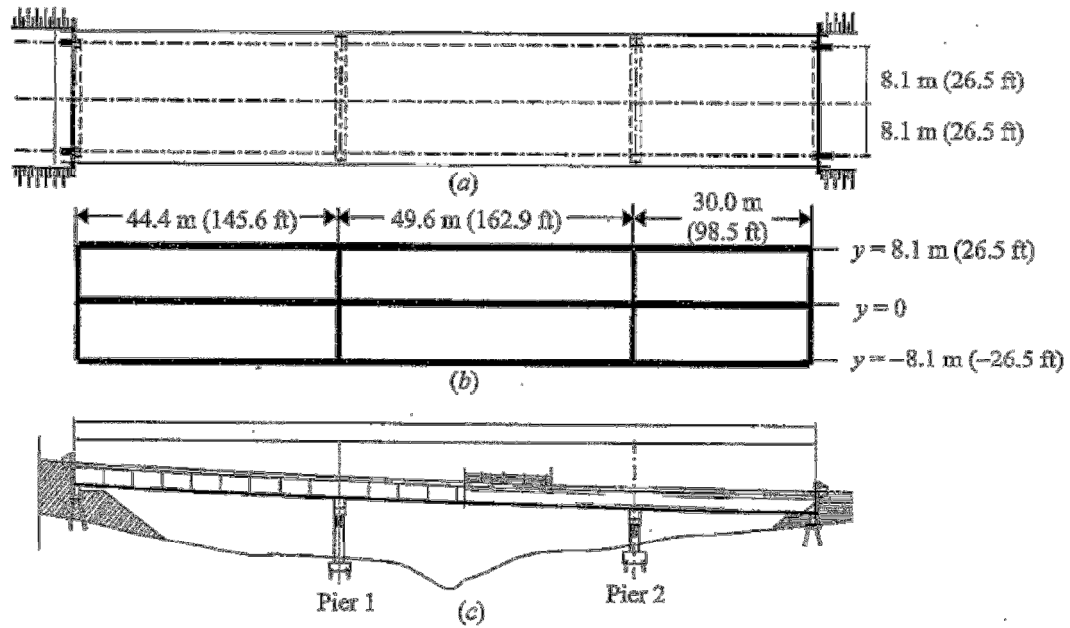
Plan and elevation of Portage Creek Bridge (Huffman et al. 2006)
